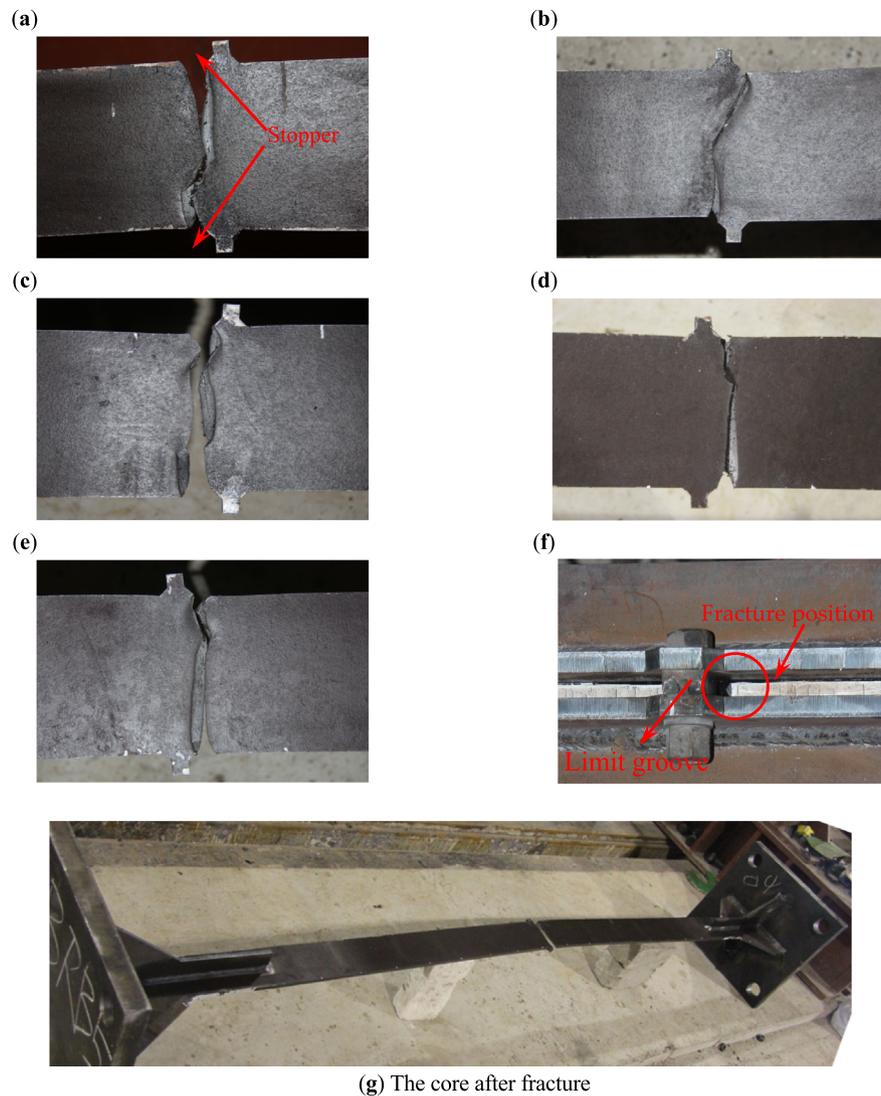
Failure modes of specimens: (a) Specimen 1; (b) Specimen 2; (c) Specimen 3; (d) Specimen 4; (e) Specimen 5; (f) Fracture position; (g) The core after fracture
